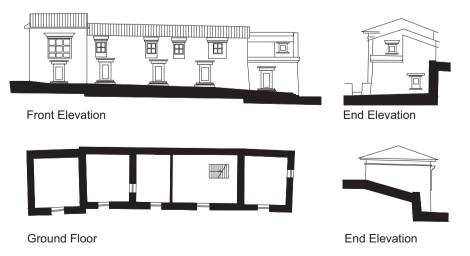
Floor plan and elevation of Sherpa house (after [17]).
